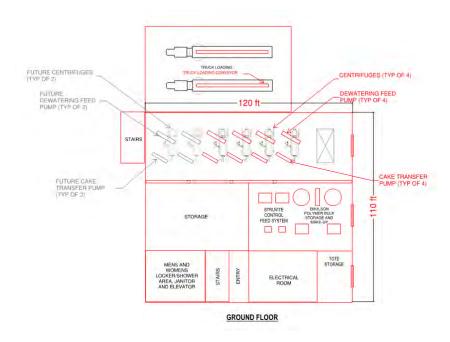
Dewatering Centrifuge Ground Floor Layout
